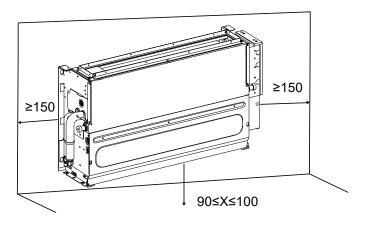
F5 series (air inlet from bottom) Exposed Floor Standing space requirements (unit: mm)
